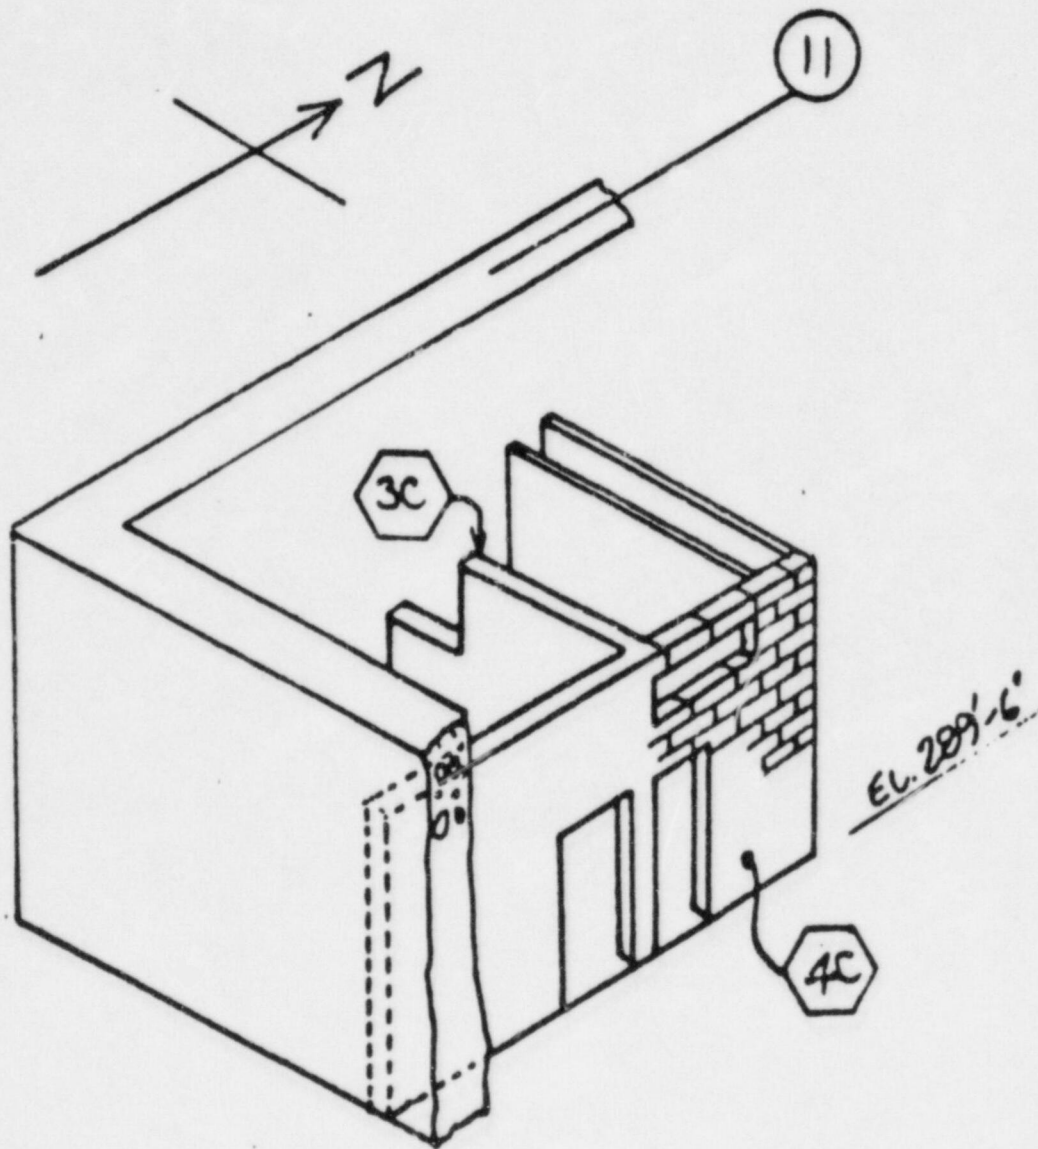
Control Building Walls Elevation 289 feet, 6 inches
